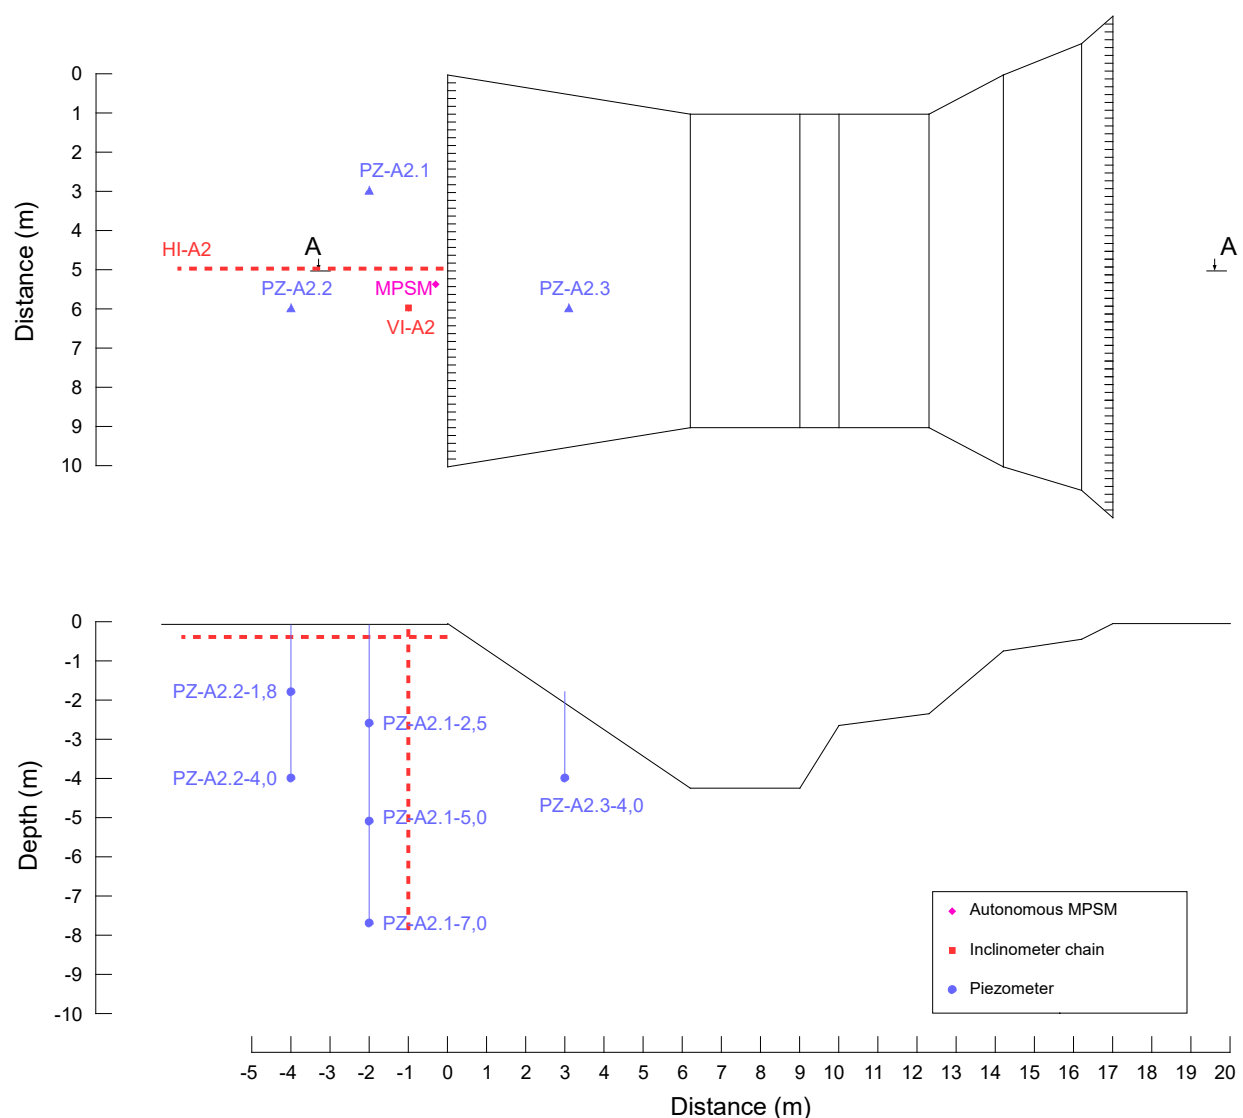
Plane view (top) and profile view (bottom) of trench A2, 10 m long, about 20 m wide and about 4.2 m deep, with a 1.6:1 wall and a benched wall.
